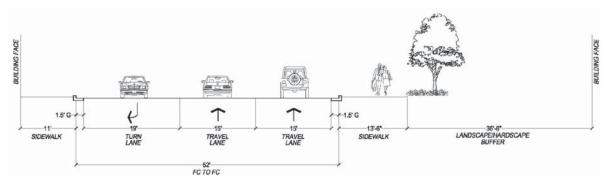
Existing cross-section of 12th Street S. looking west between Crystal Drive and S. Clark/Bell Street
